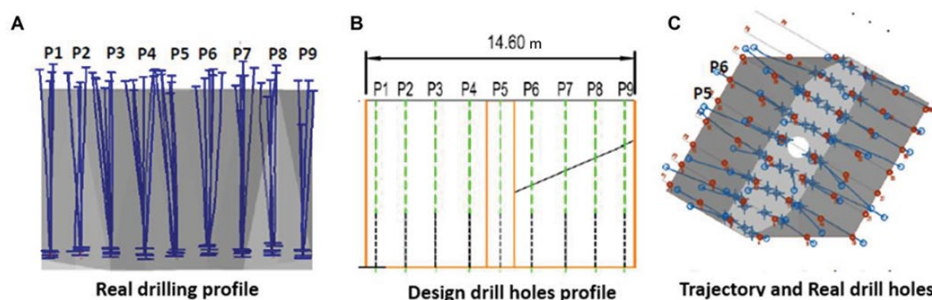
Sections showing actual and design drill-holes. (A) Side view of the actual drilling profile with drill deviation, (B) side view of the design drilling profile, (C) plan view of the actual drilling profile and trajectory (based on Paredes and Rodriguez, 2018)
